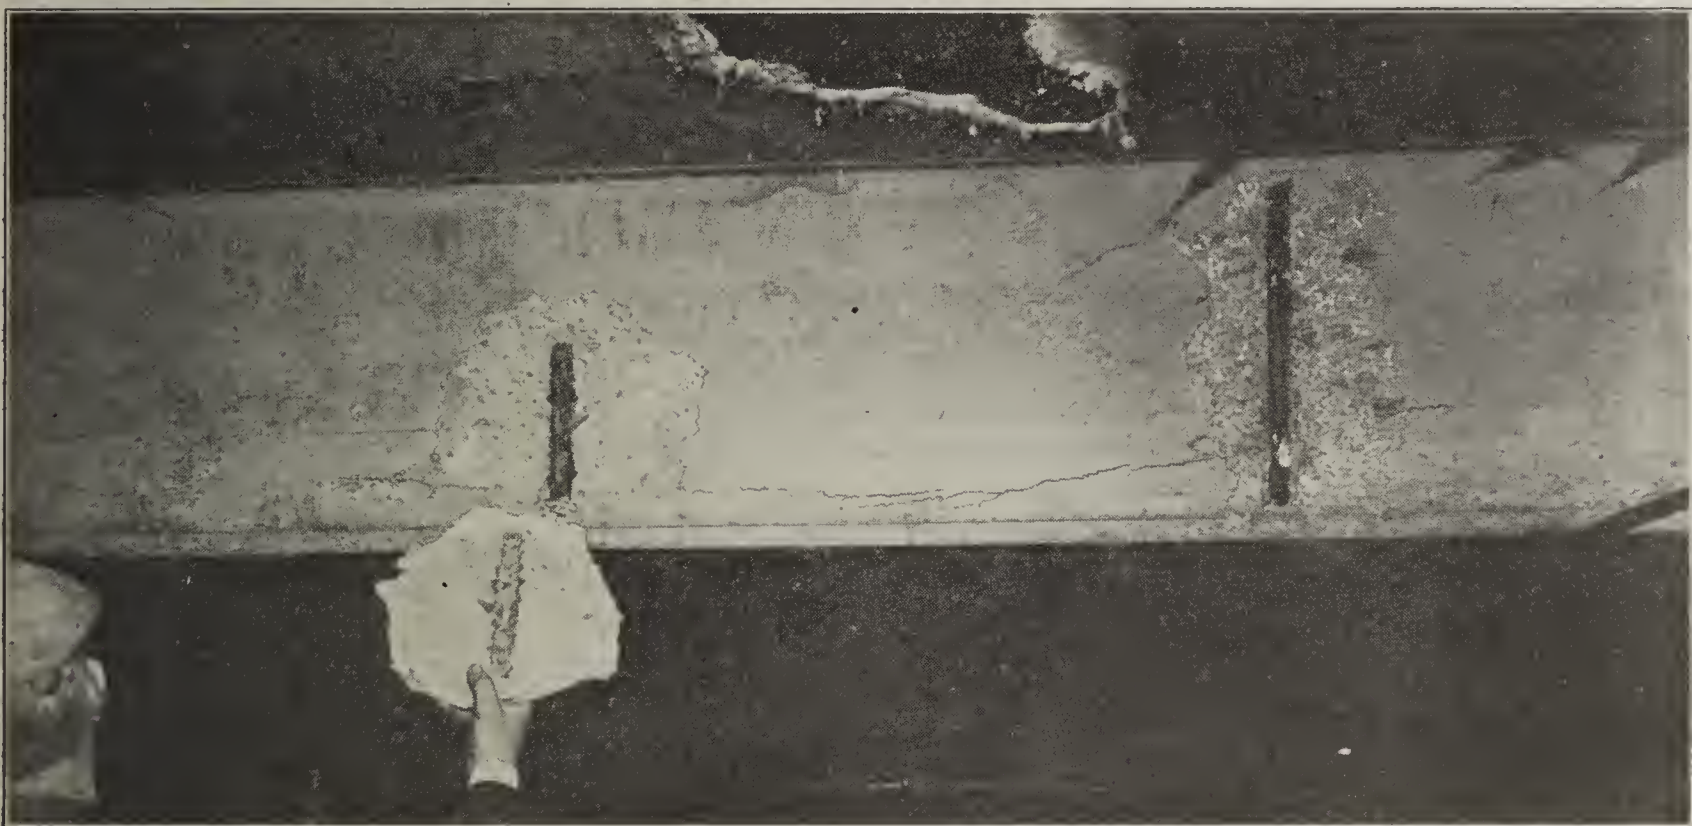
Concrete Forced Off at Stirrup of Beam.
